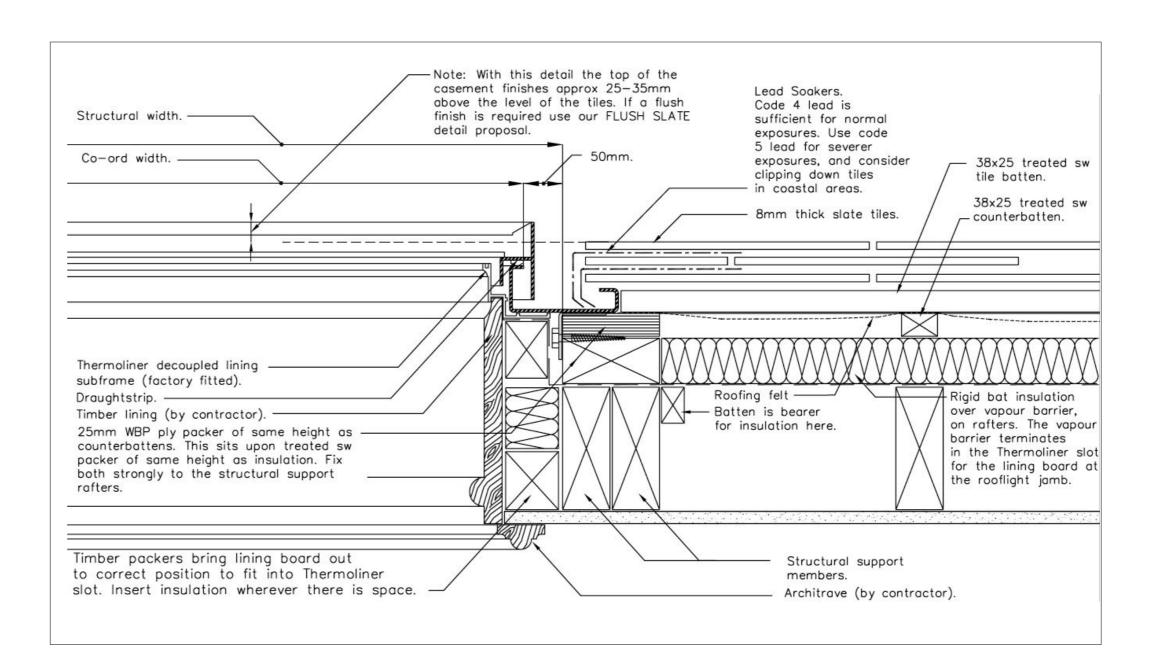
ROOF LIGHT HEAD DETAIL NOT TO SCALE
